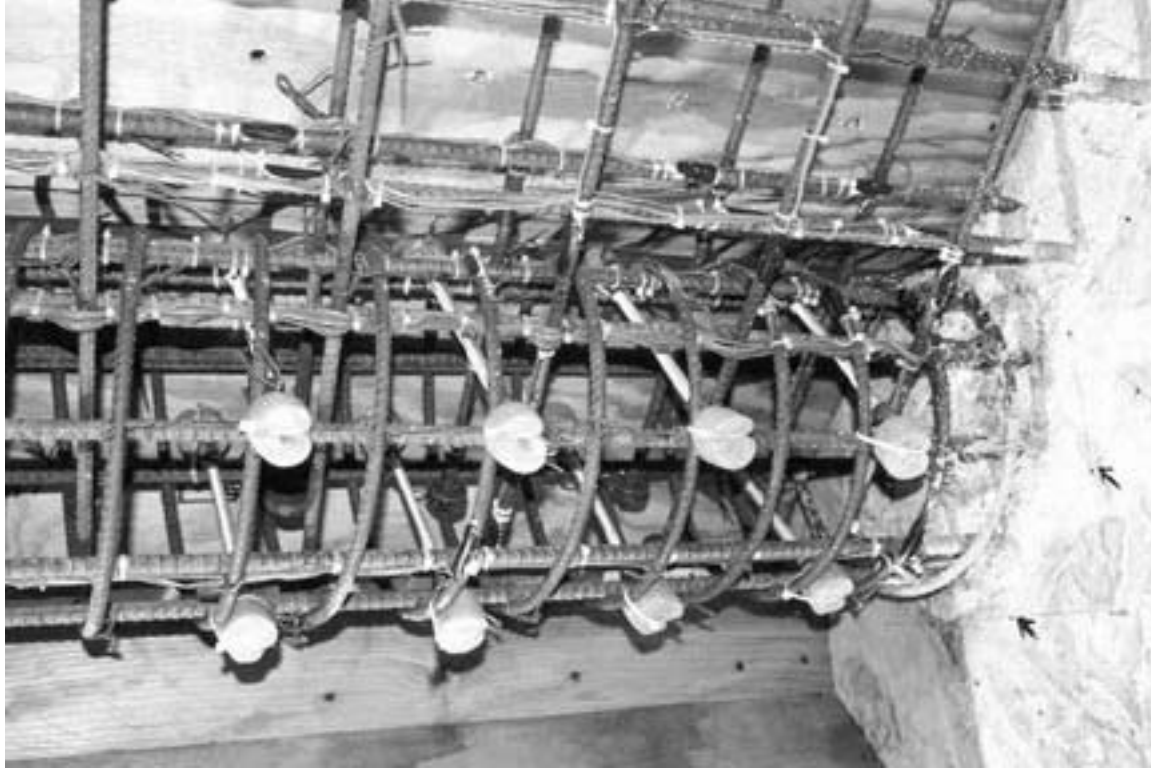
Test Unit 1A: detail of footing and column reinforcement.
